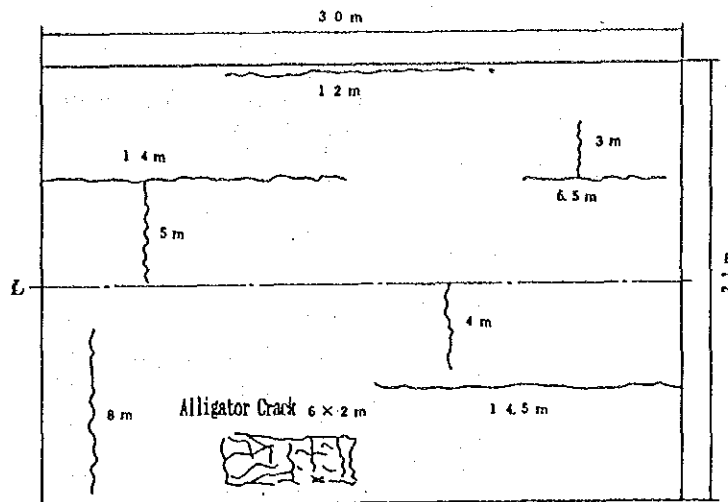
Sample of Crack Measurement on Flexible Pavement
